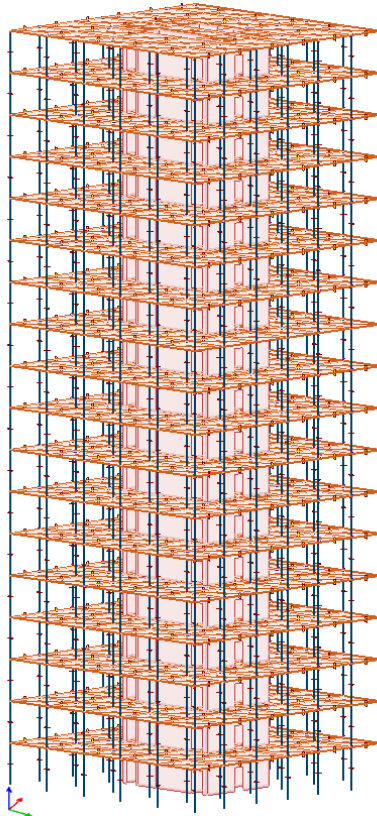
Hybrid timber building with glulam timber beam and column structural system with CLT slabs and a concrete core extending along the buildings height.
